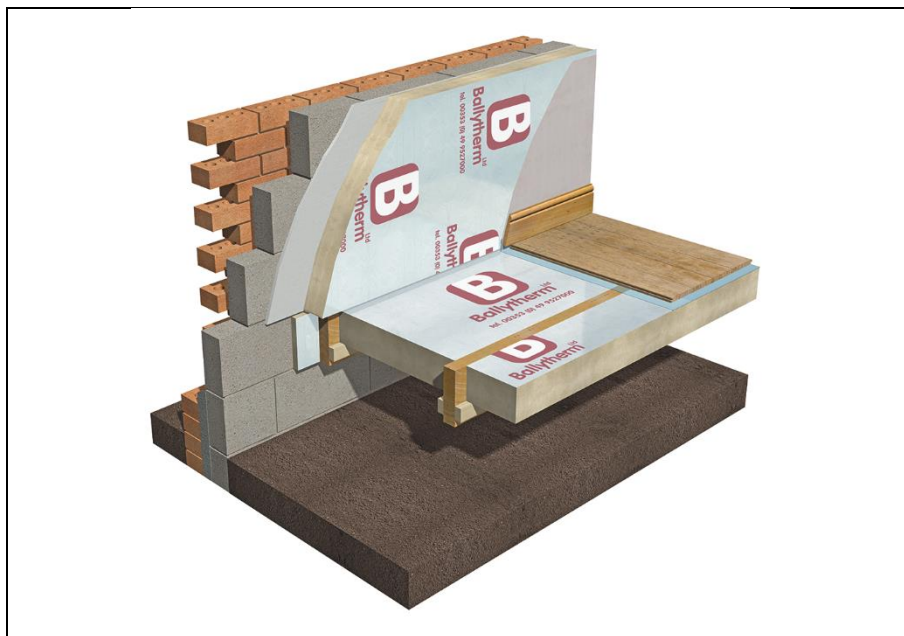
Ballytherm BTDL Dry Lining, mechanically fixed to timber battens
